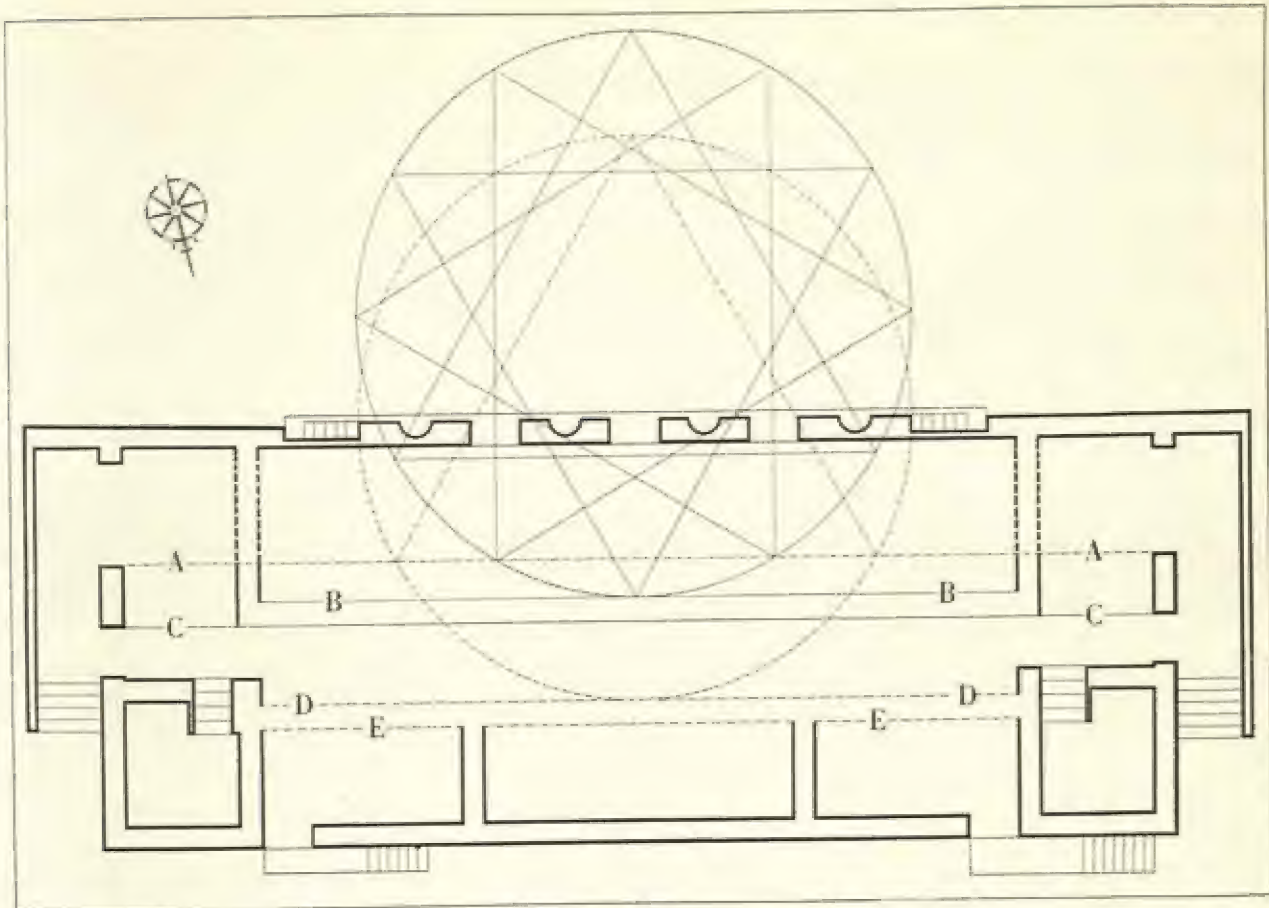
Soli. The theatre. Reconstructed plan of the stage-building.
